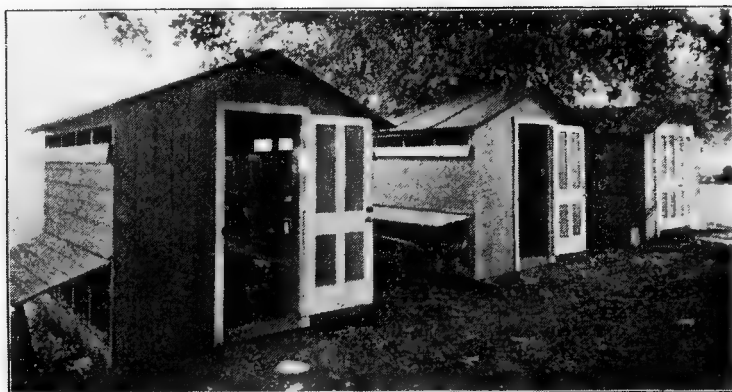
Small fattening houses at Iowa Agricultural College. Note thorough ventilation
